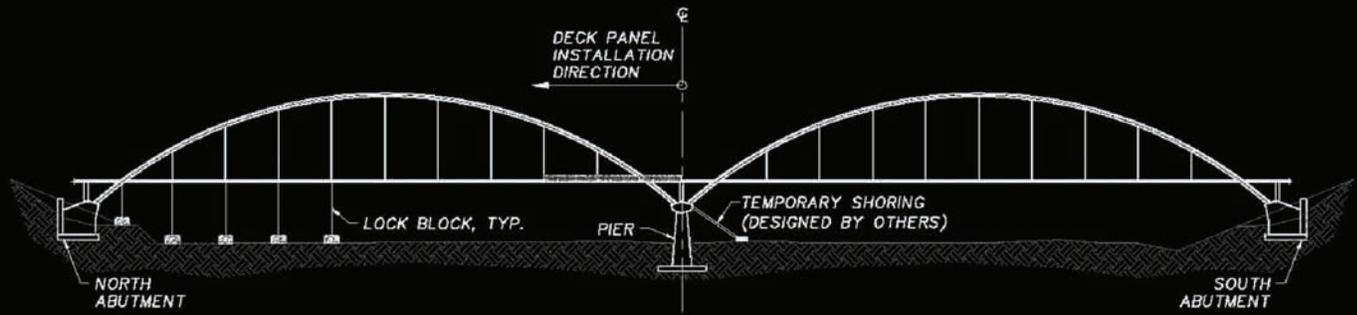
Revised Erection Scheme for Heavier Deck Panels
